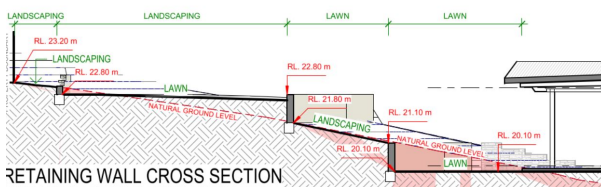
Extract of the section plan for the retaining walls within the rear yard.
